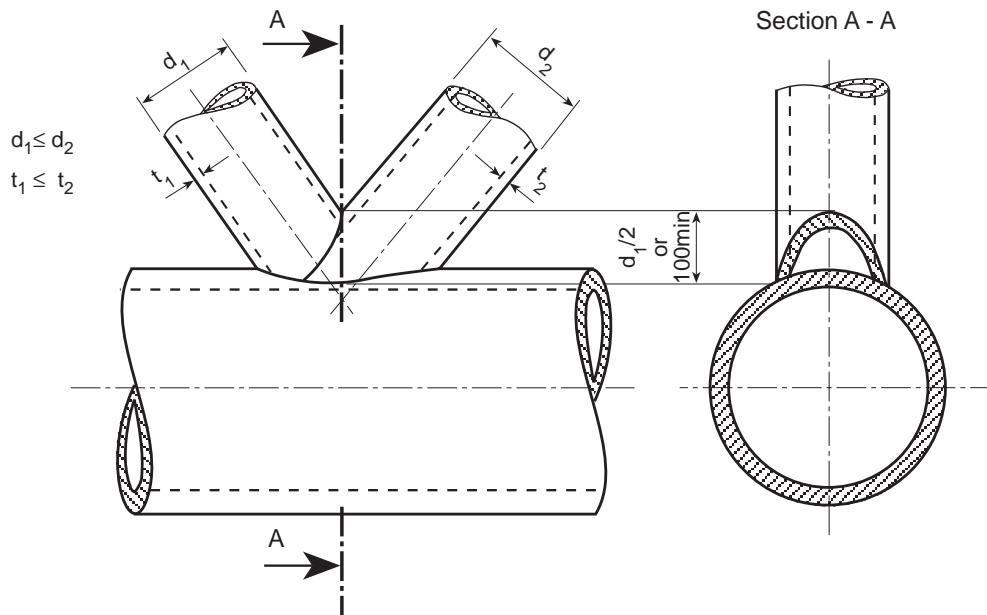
Separation of welds in tubular joints
